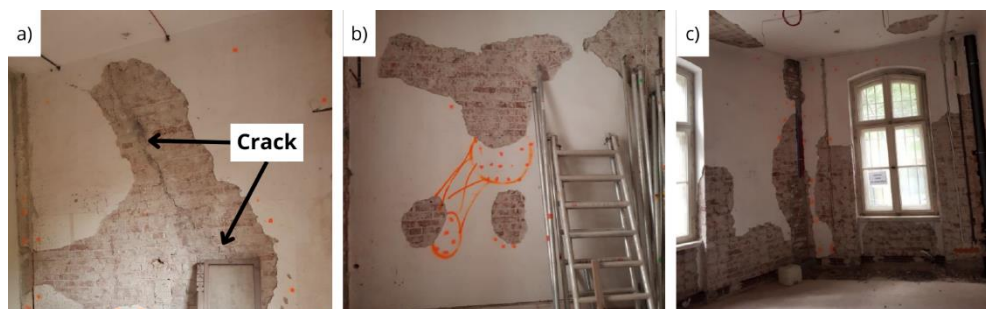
Views of damage and defects in plasters: a) caused by a crack in the wall b, c) caused by delamination
